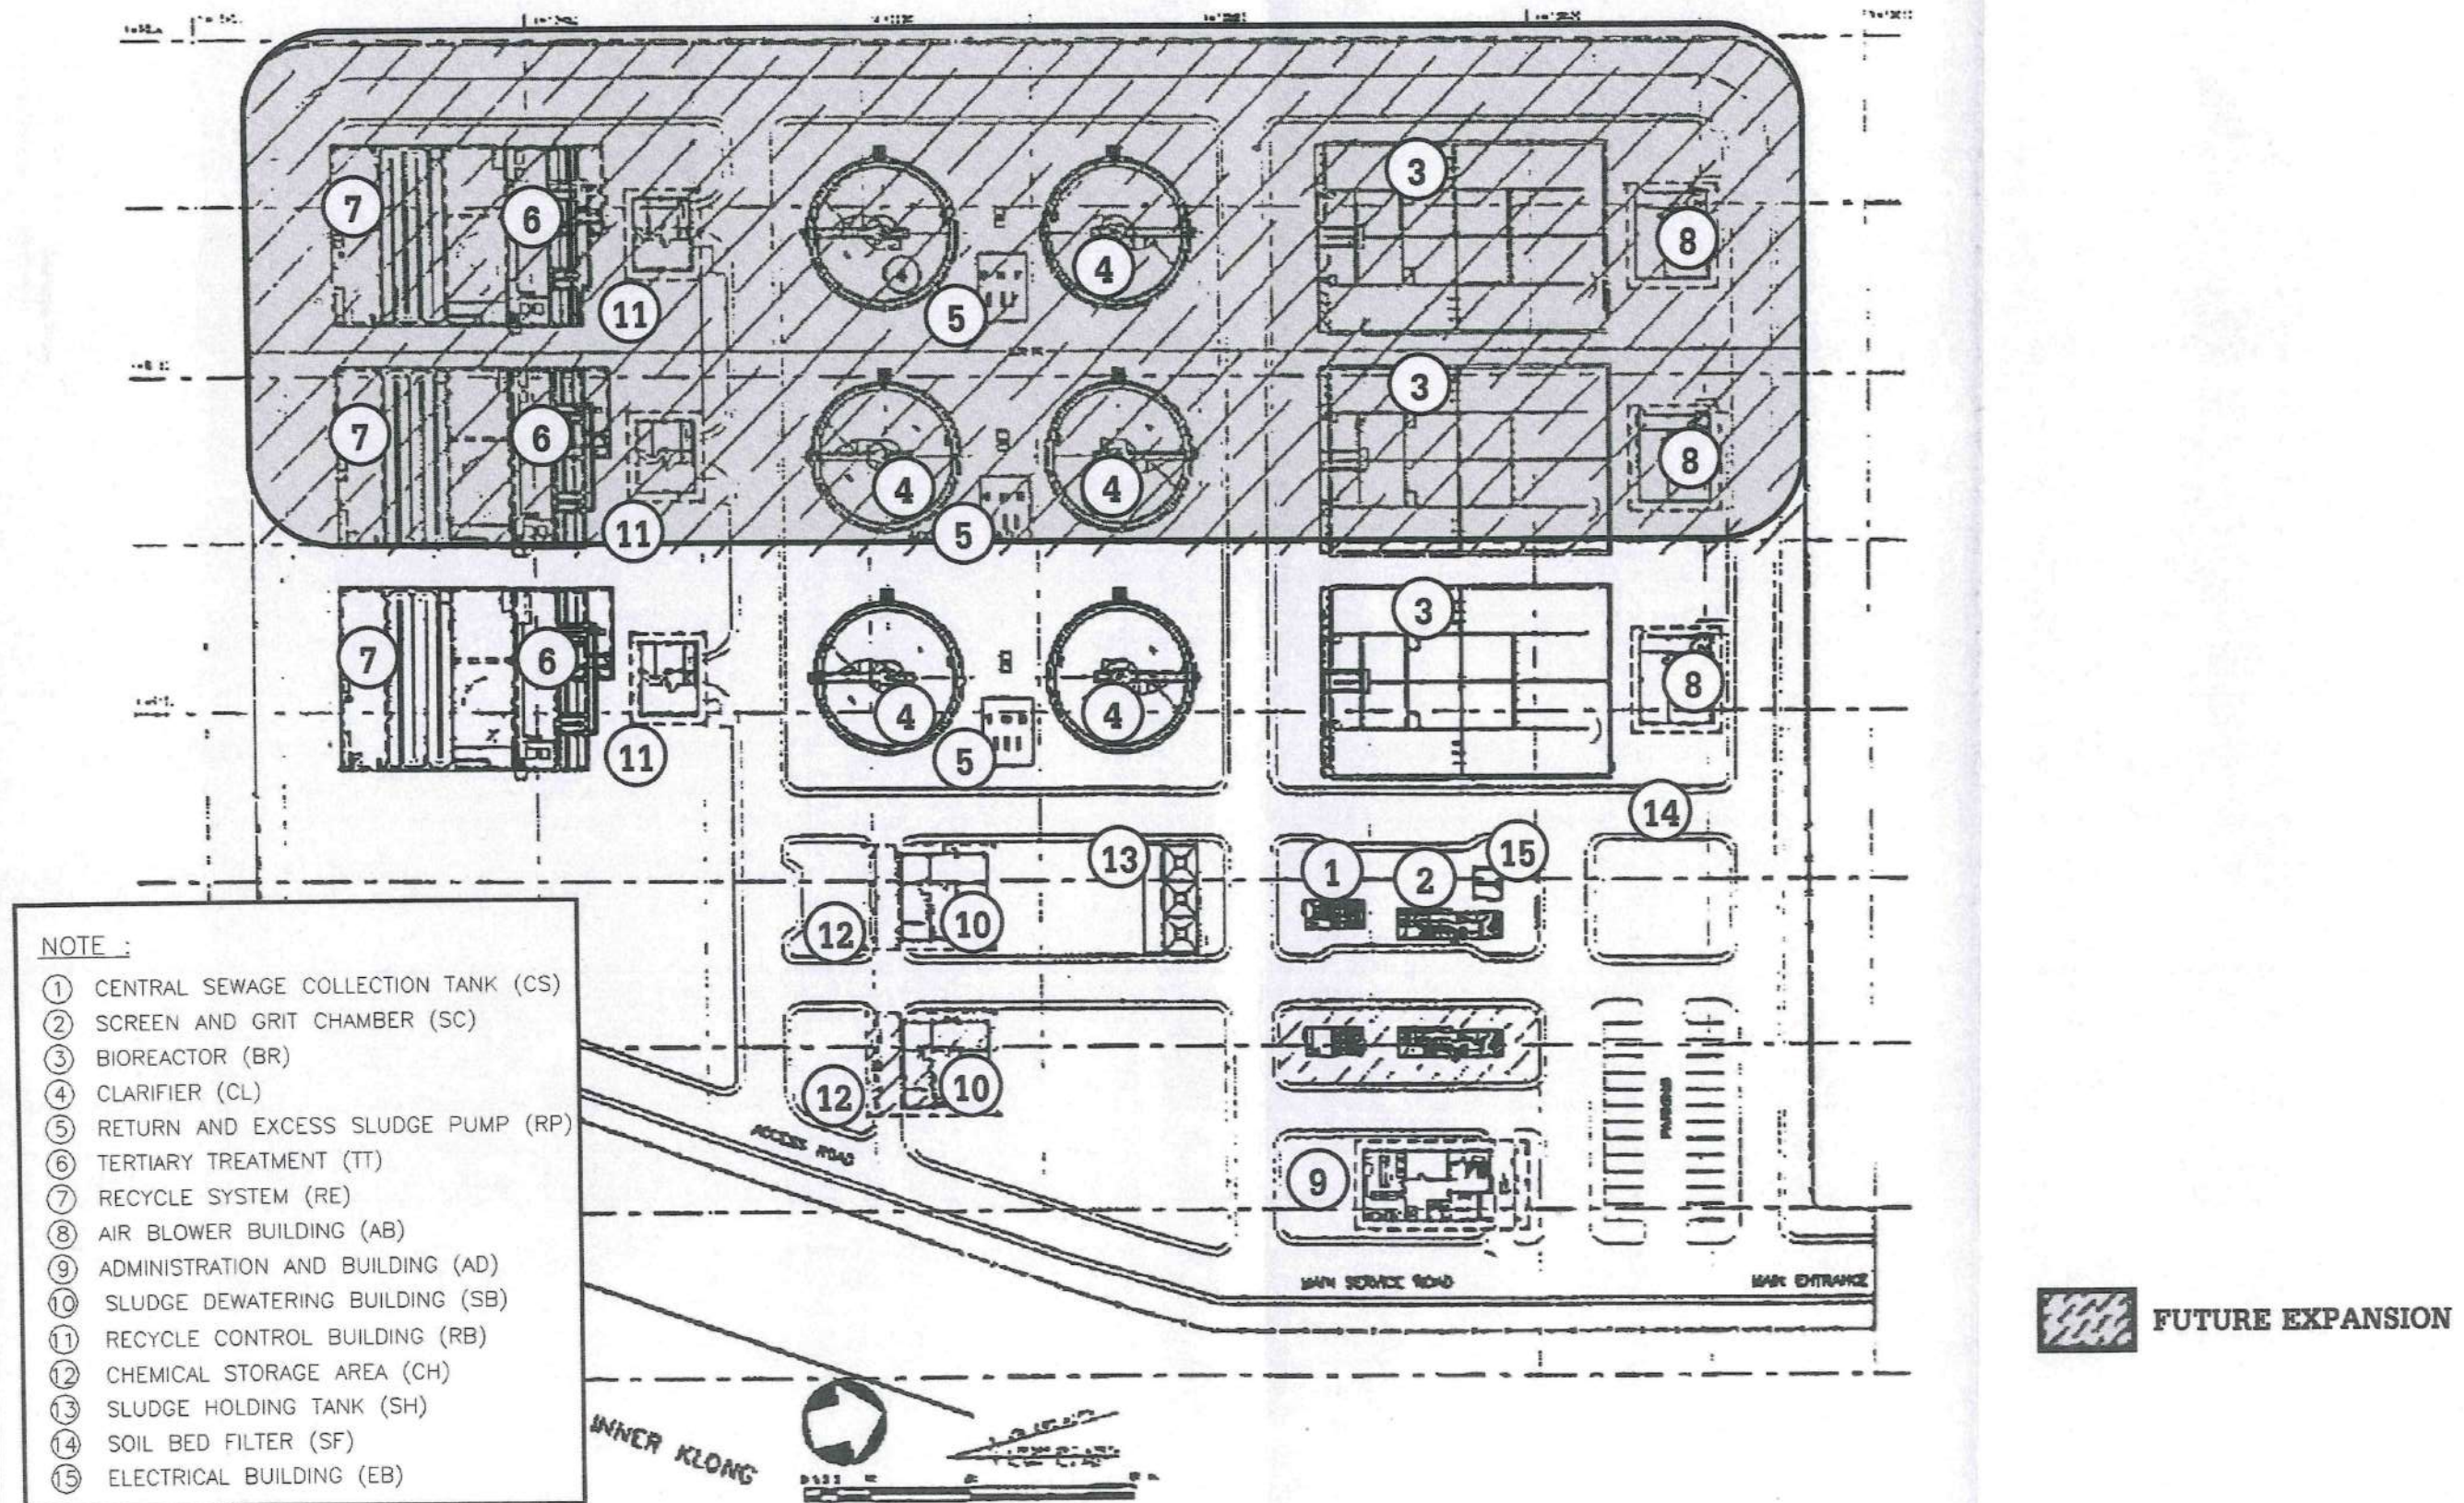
WASTEWATER TREATMENT PLANT LAYOUT
